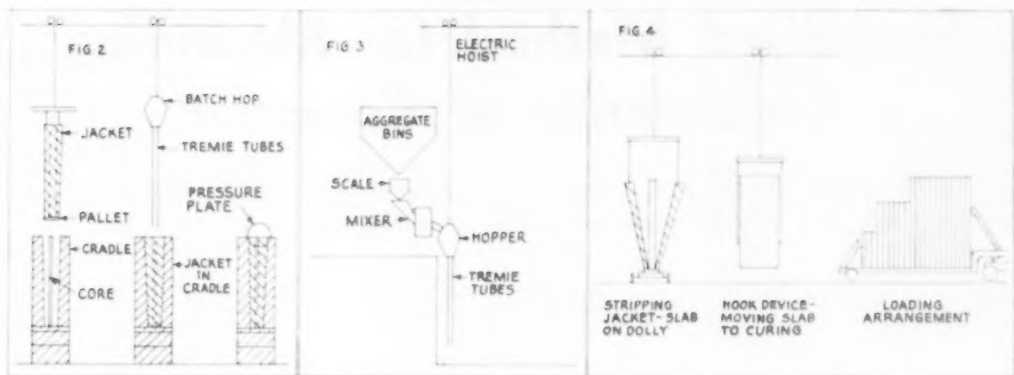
Casting operation. Fig. 3: Arrangement for mixing and batching transfer. Fig. 4: Stripping jacket, slab on dolly; hook device, moving slab to curing, and loading arrangement
